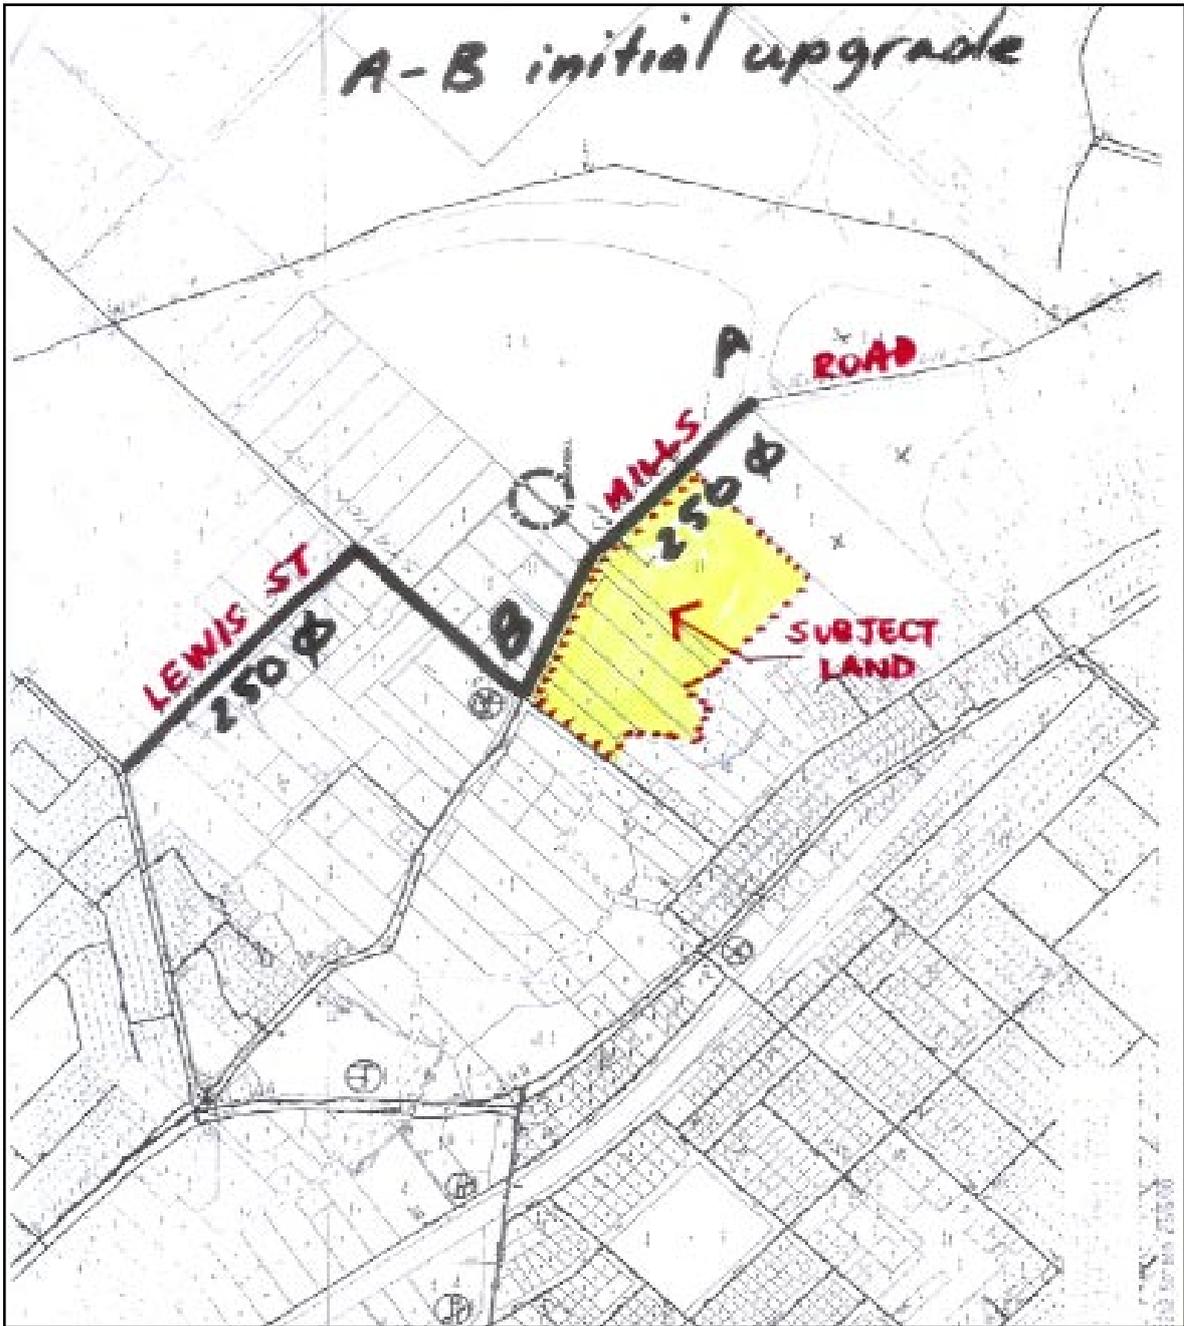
WATER HEADWORKS & UPGRADE PLAN
